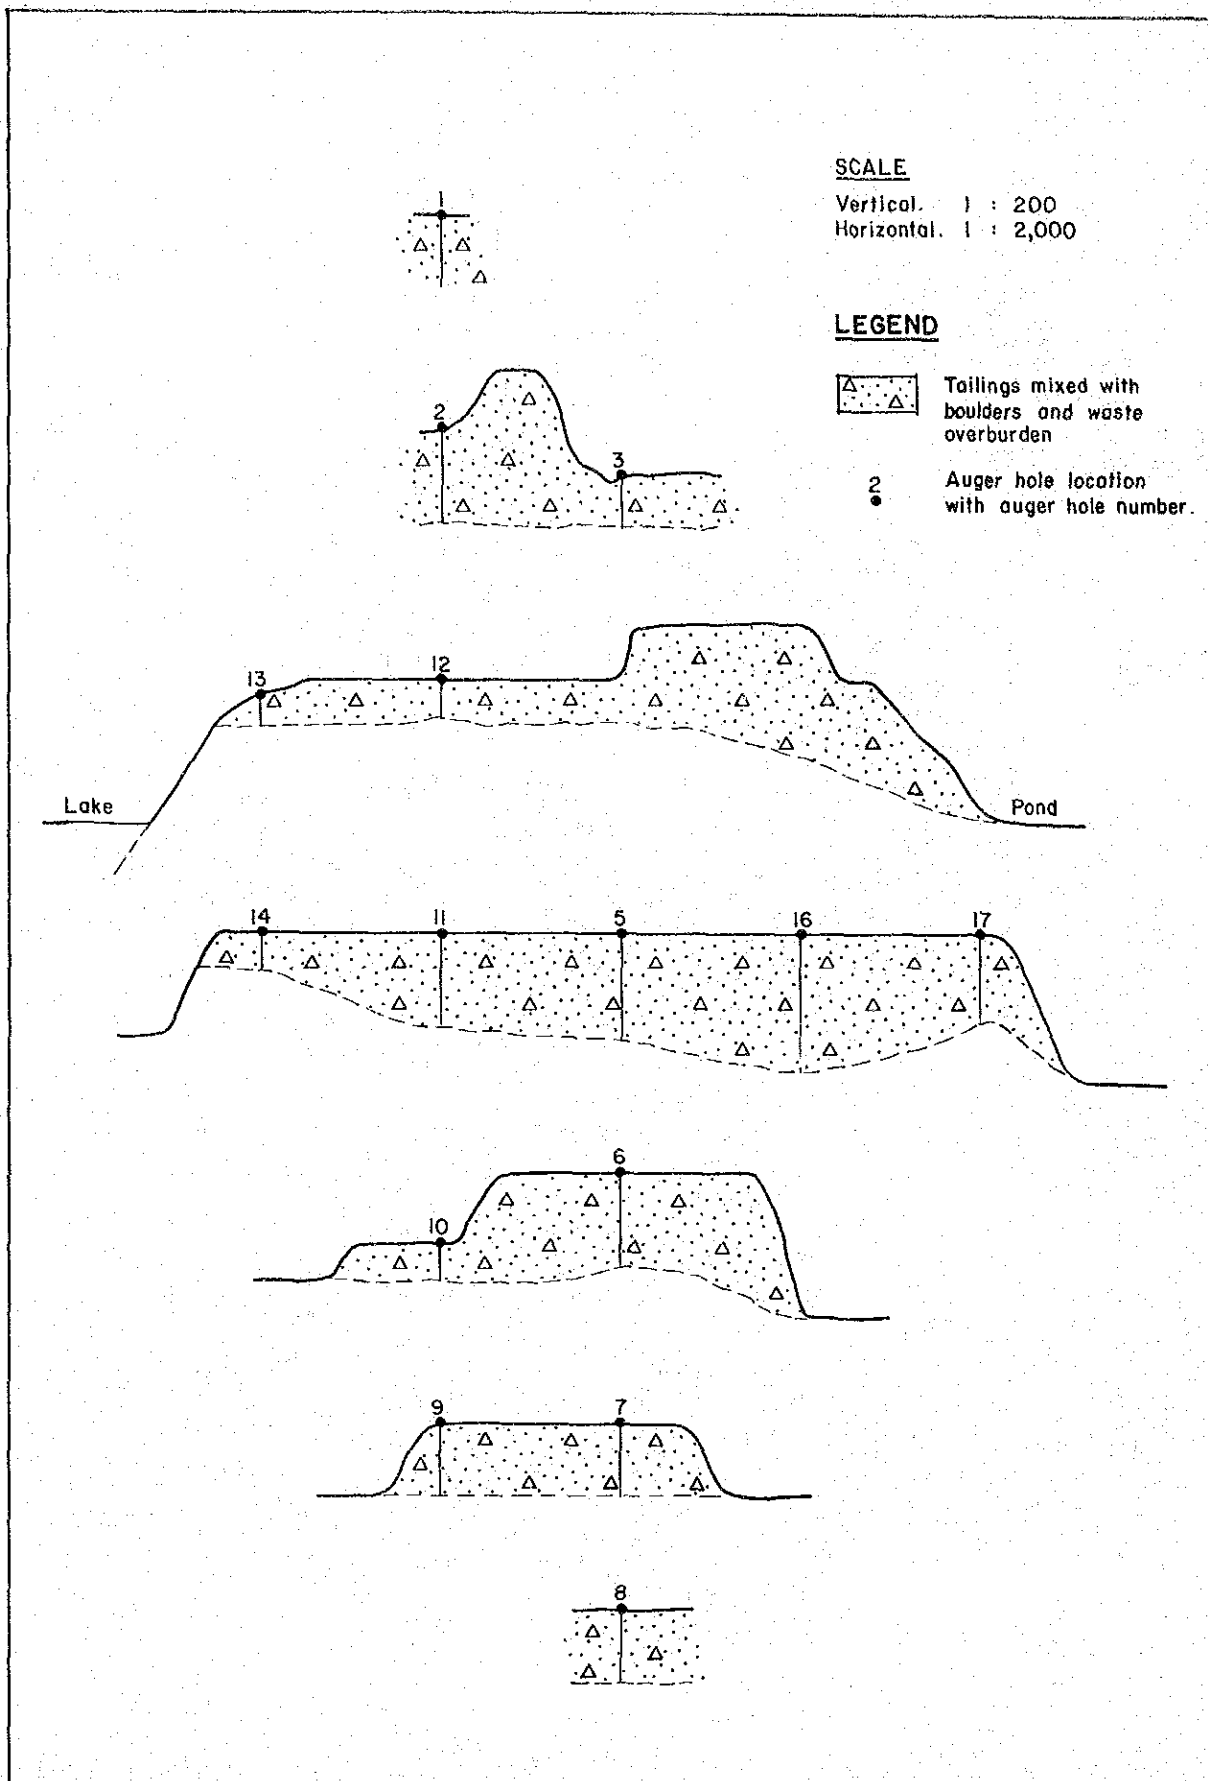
Section of Mine Tailing Dump, Old Bau Airstrip
